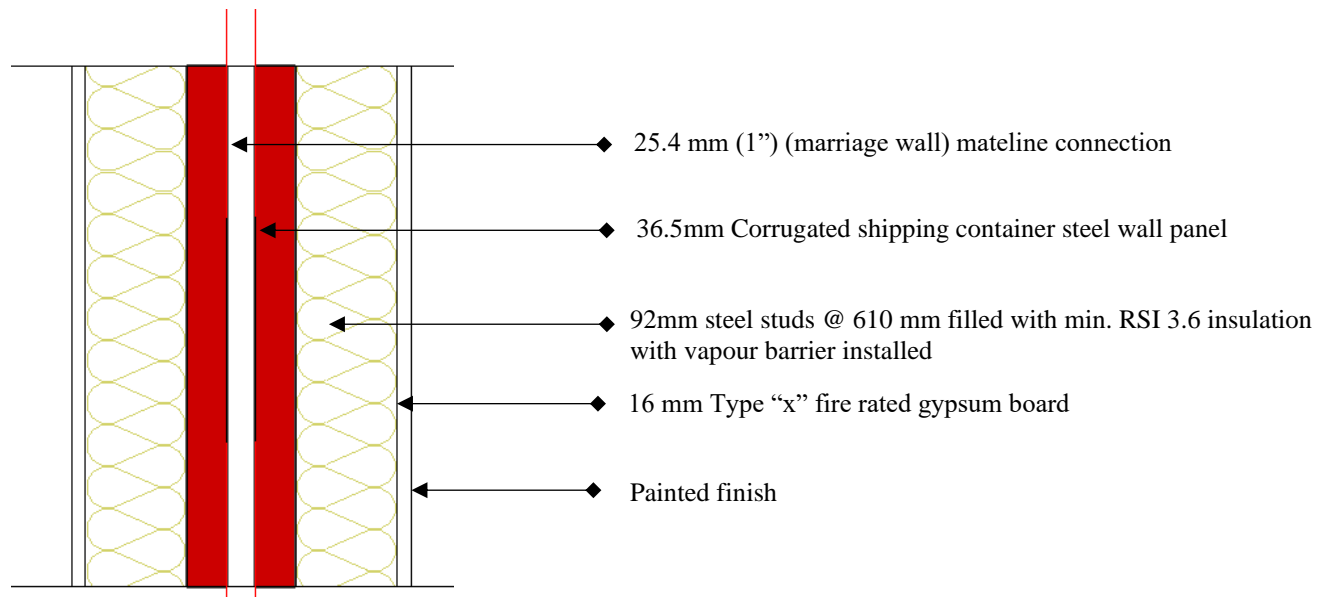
D-02 Typical Container Mate Connection (Marriage Wall)
